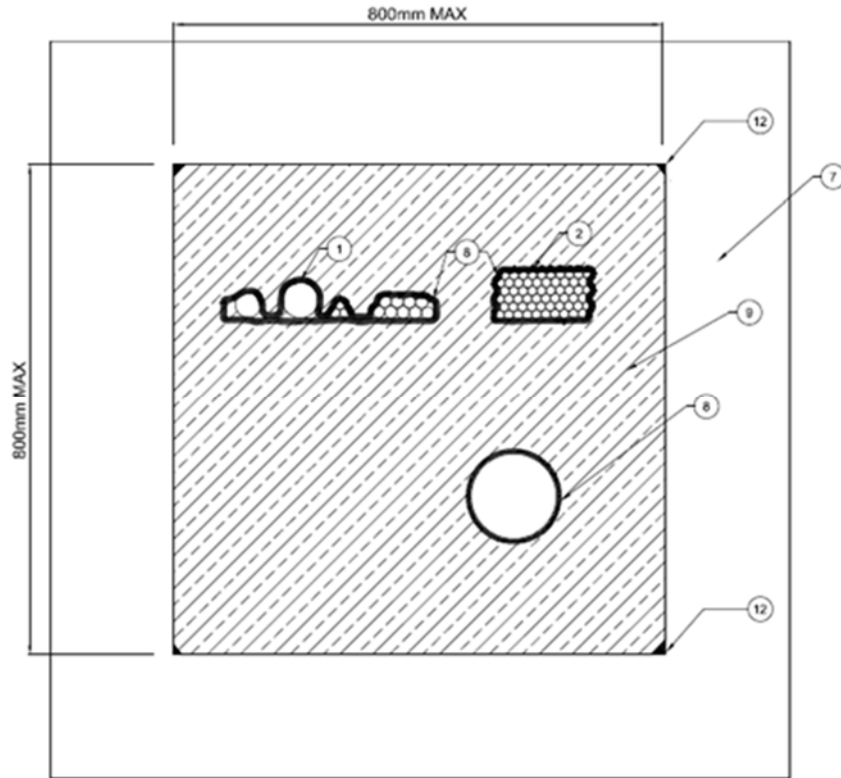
Typical arrangement of apertures filled with 3M Fire Barrier Pillows in floors
